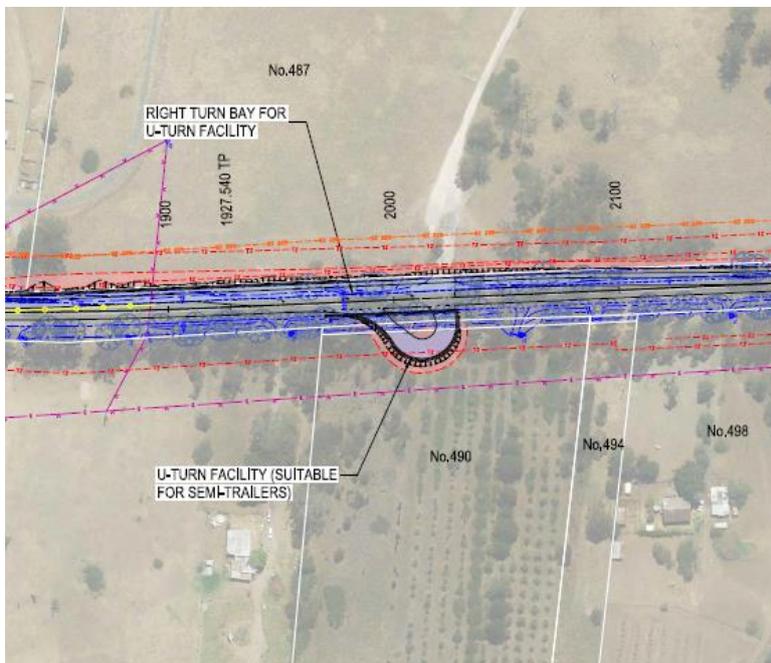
Proposed U-turn facilities located north (as indicated above) and south of the existing southbound overtaking lane which would require property acquisition and new pavement.
